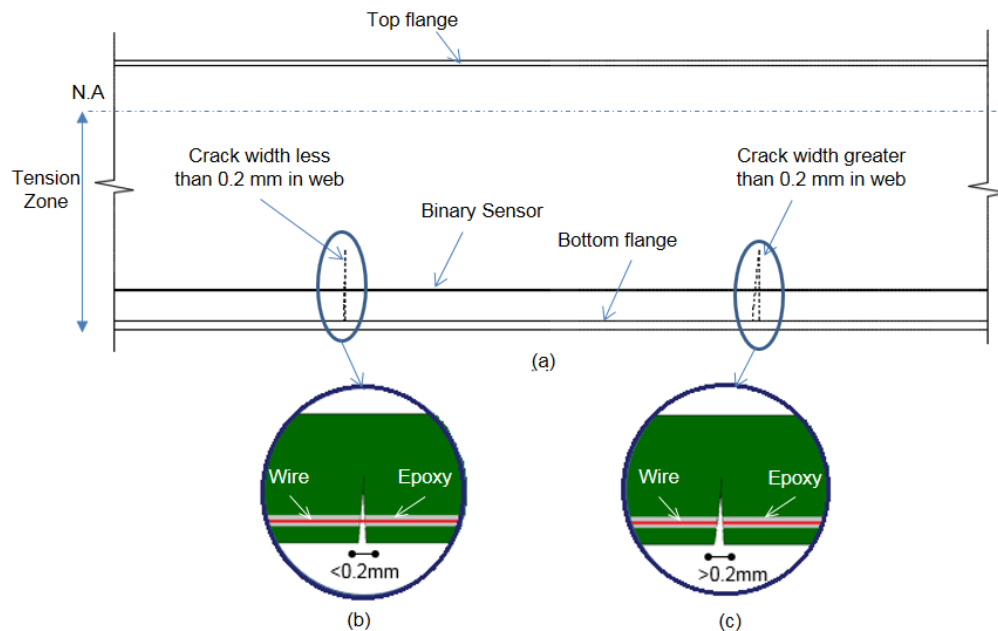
1. a) The Binary sensor is installed on the entire length of the steel girder. The epoxy adheres the wire to the steel girder. When crack forms in steel girder, the strains will be transferred from steel girder to the epoxy b) as long as the crack width is less than 0.2mm, crack propagates through the epoxy but wire is still connected c) over time, under tensile stresses, crack widens to 0.2mm width and causes the wire to break. As the wire breaks, the resistance of wire will tend to unlimited and electrical current in the circuit will tend to zero [17, 24]
